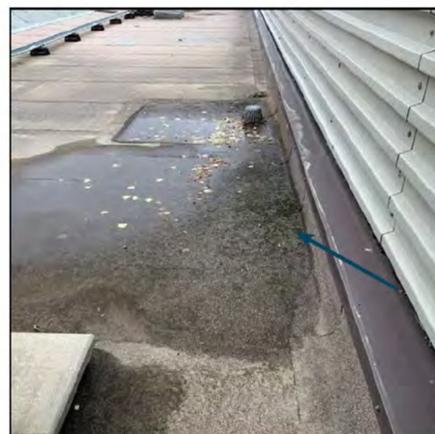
Ponding with Vegetation, South Low Sloped Roof
